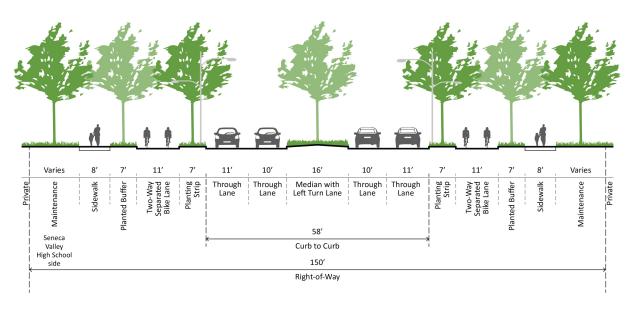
Proposed Typical Street Section for Middlebrook Road Long-Term
